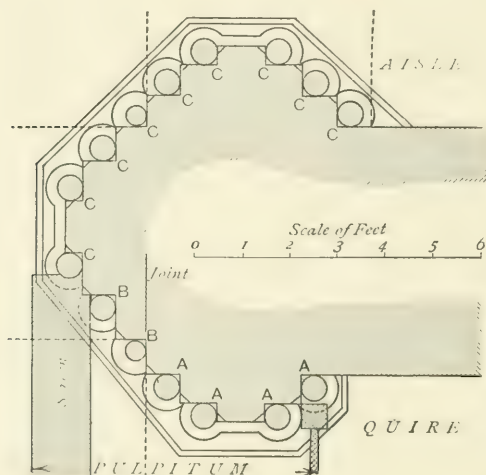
PLAN OF NORTH-EAST PIER OF CENTRAL TOWER.
